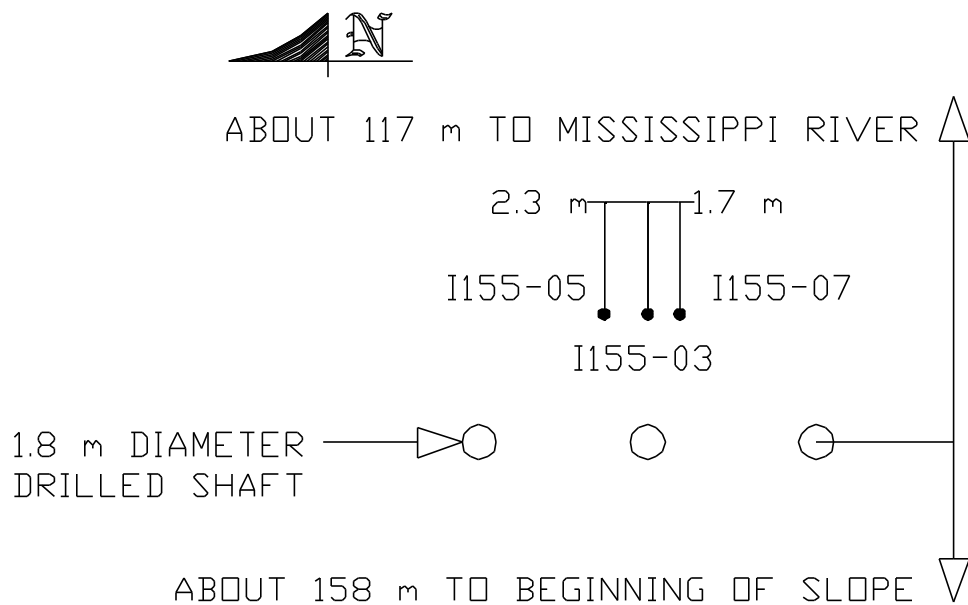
Layout of all tests performed under the I-155 bridge
